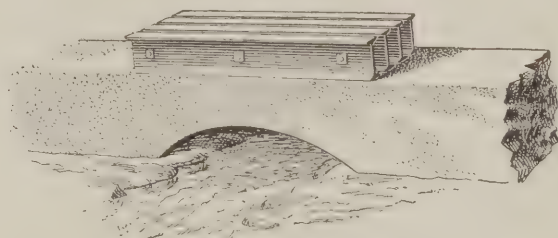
The Concrete Bridge with the I-Beams on Top.
